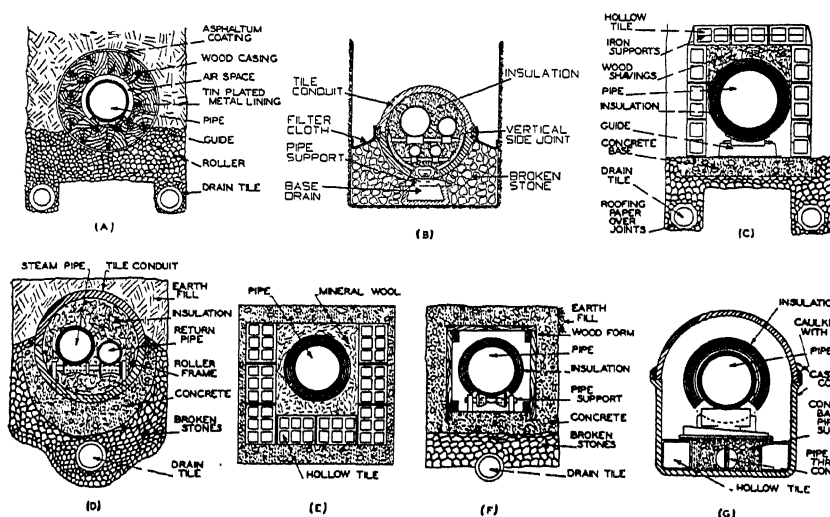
CONSTRUCTION DETAILS OF CONDUITS COMMONLY USED
